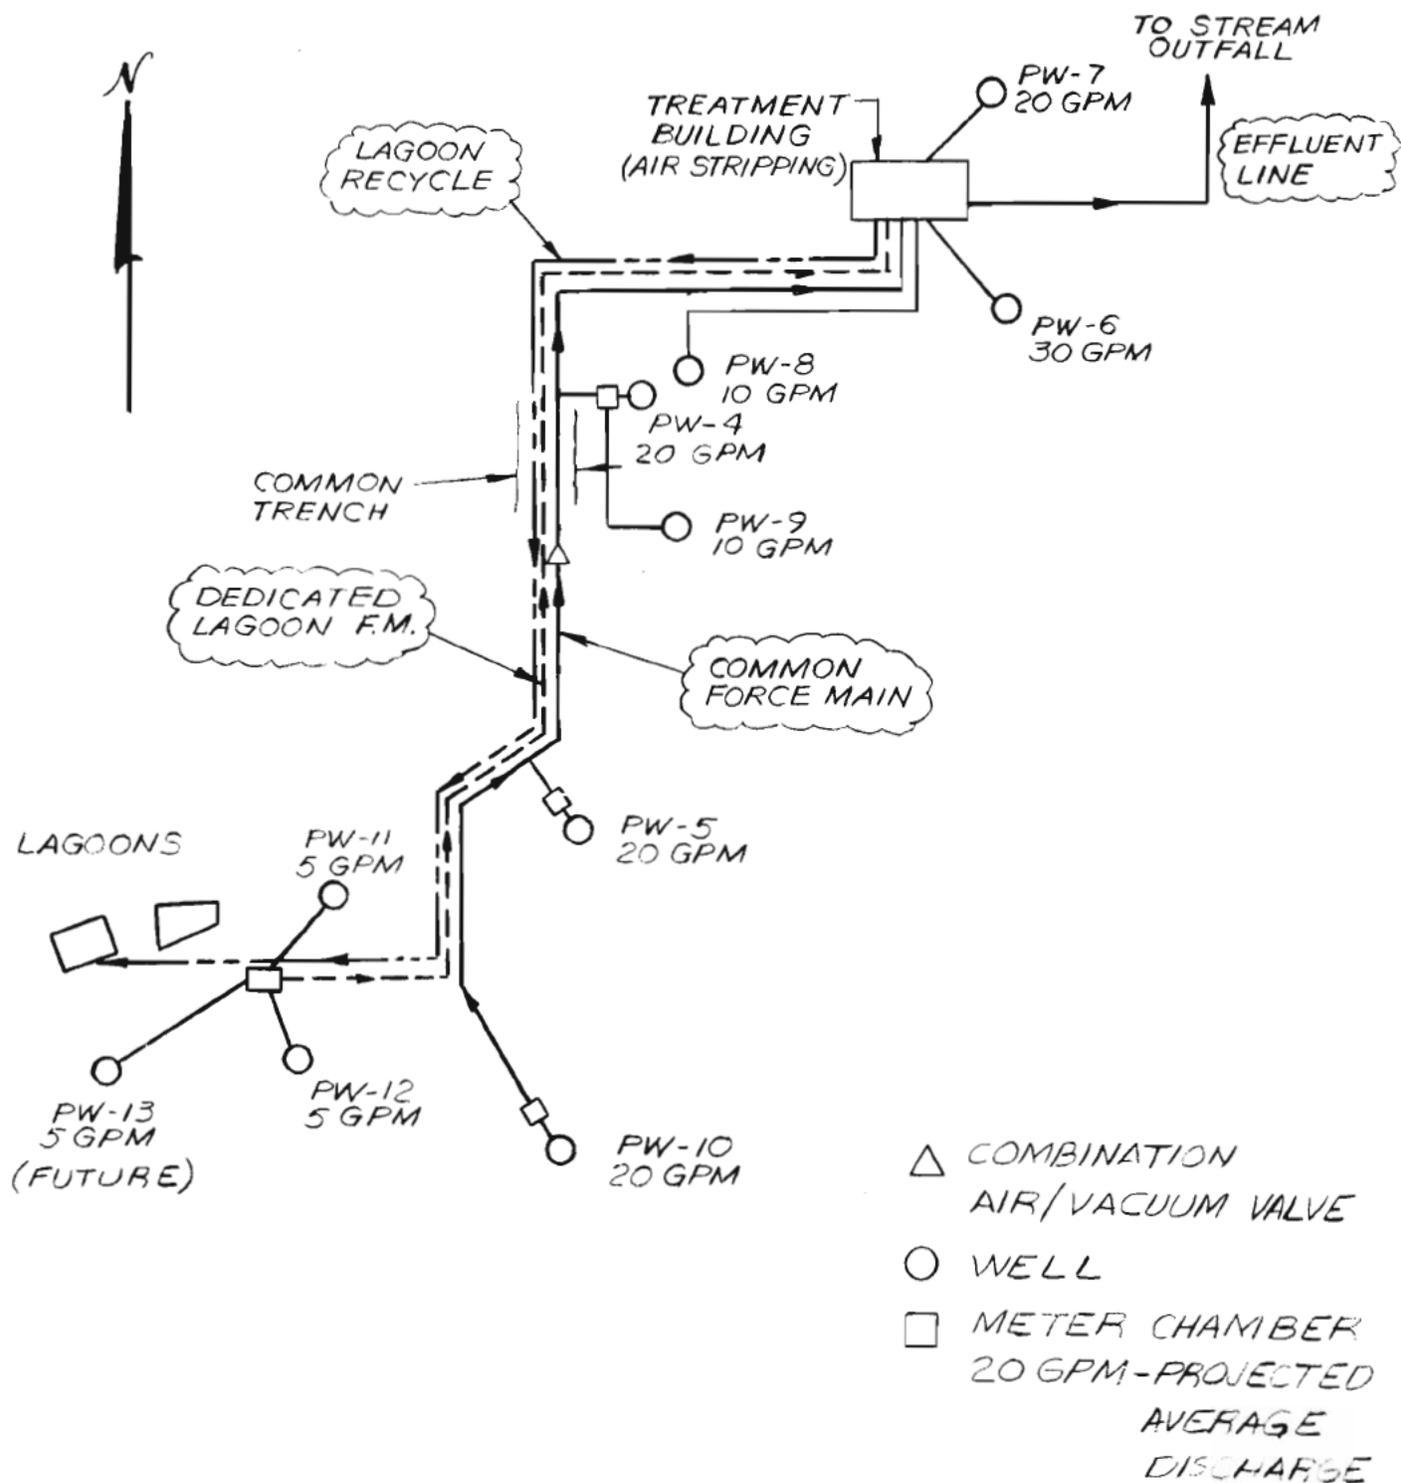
The reader is referred to the Piping and Instrumentation Diagram of the construction drawings for additional detail. The plan consists of pumping groundwater from nine wells to an air-stripping treatment facility housed in a prefabricated metal building situated on the Harris Corporation property.
